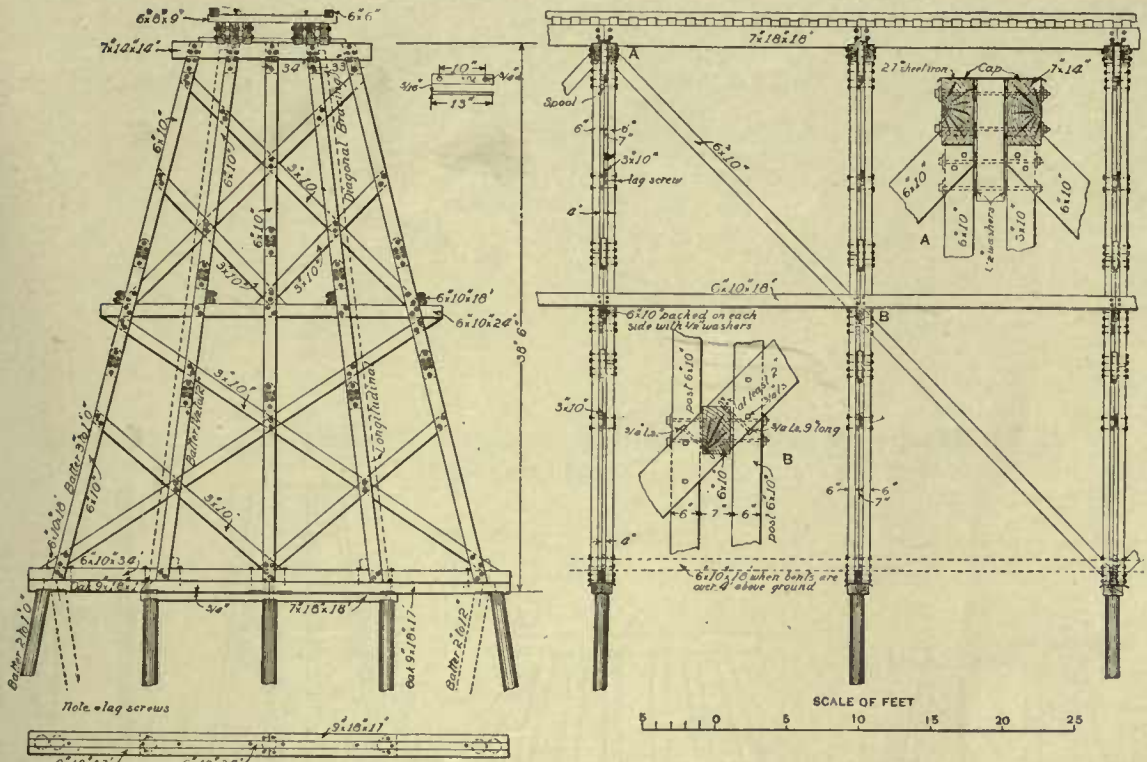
PLATE XXX.—STANDARD FRAMED TRESTLE, TOLEDO, ST. LOUIS & KANSAS CITY RAILROAD.
